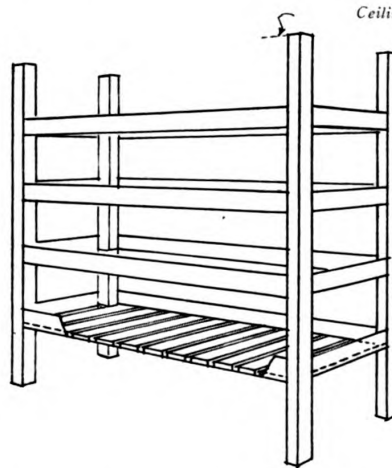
The Vegetable Room Can Be Provided with Open Slat Bins
